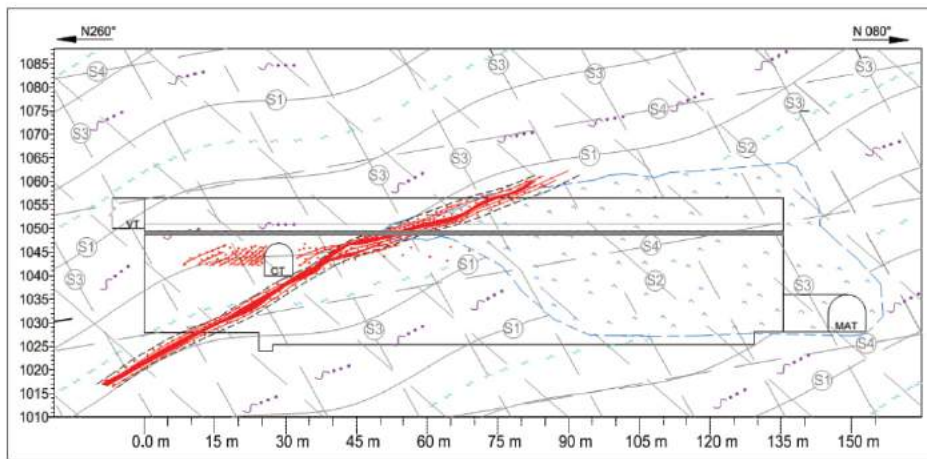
Geological section along downstream wall of transformer hall cavern showing disposition of shear zone
